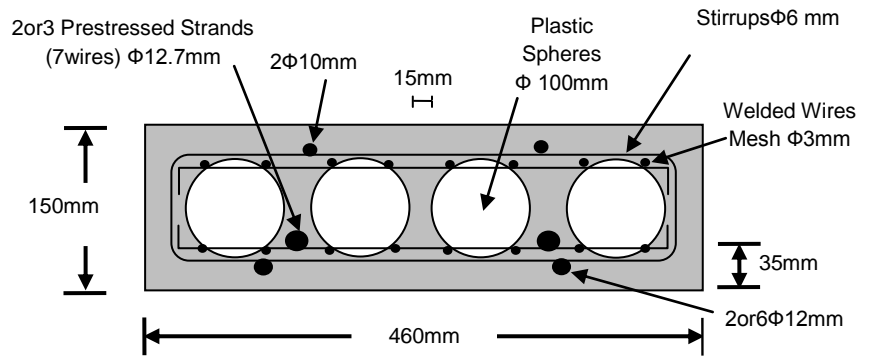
Reinforcement Details for Bubbled Slab of Group Two.
